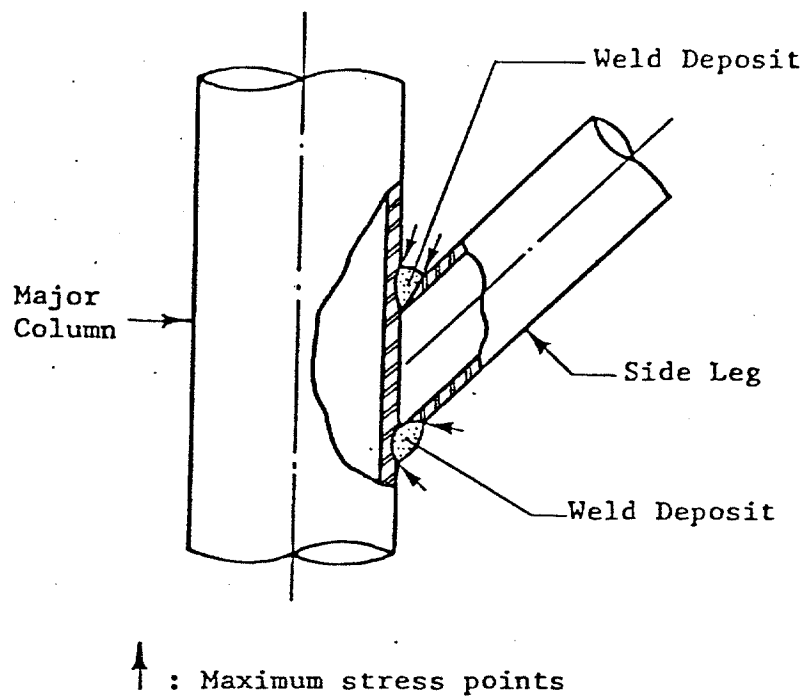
Typical Weld Profile for an Offshore Pipe Weld
